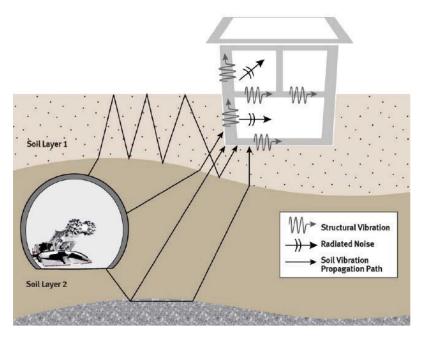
Ground-borne noise generation in buildings on surface during tunnelling excavation (source: Cross River Rail, EIS Chapter 16)
